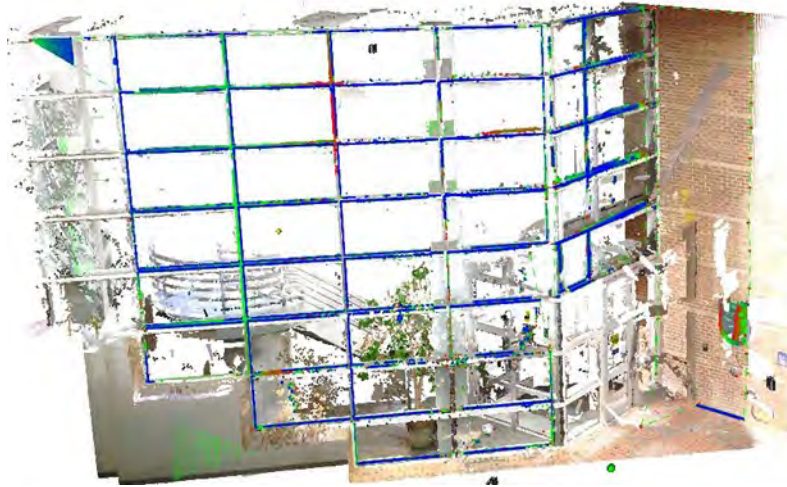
Heat Mapping of the Cameron Building Curtain Wall
